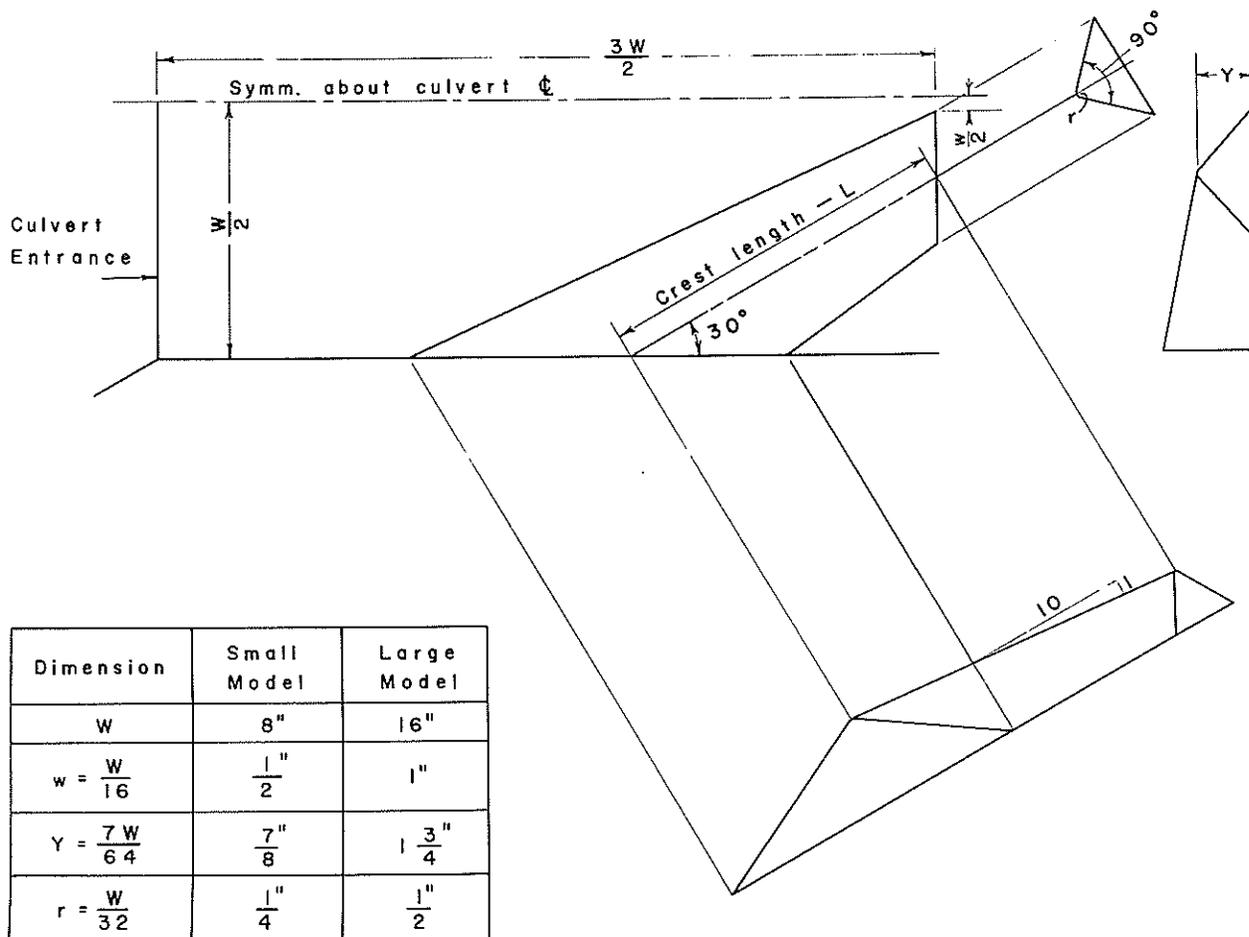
Dimensions of weir sills and their placement within the culvert.
